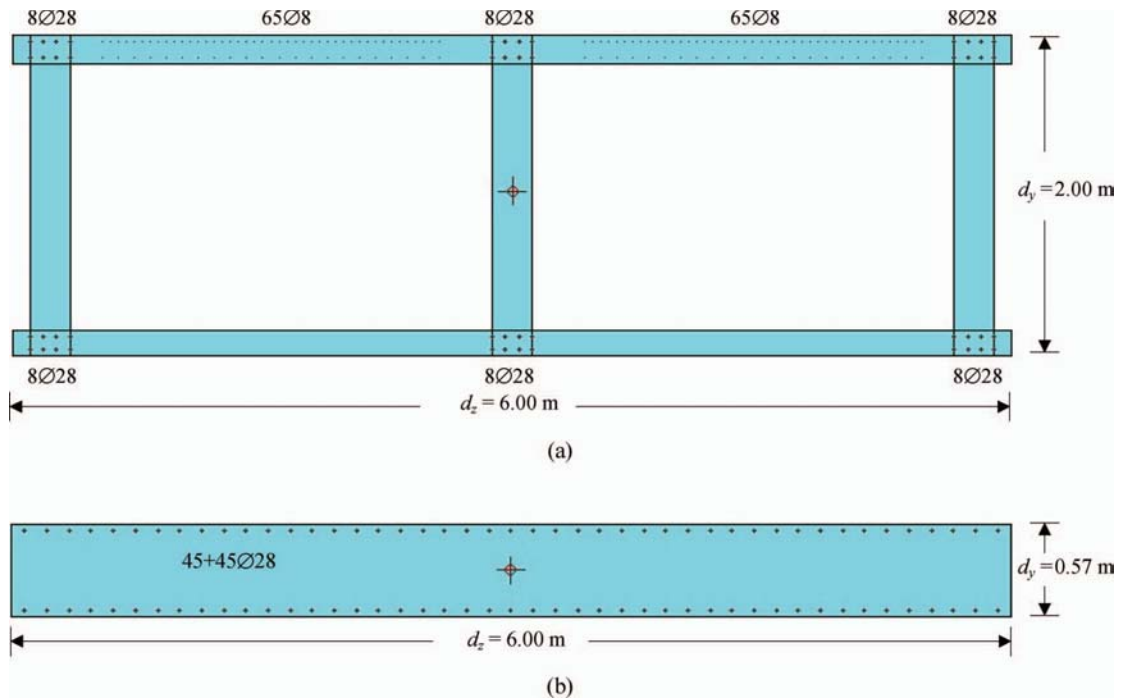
Details of the cross-sections: (a) beam (middle span), and (b) arch.
